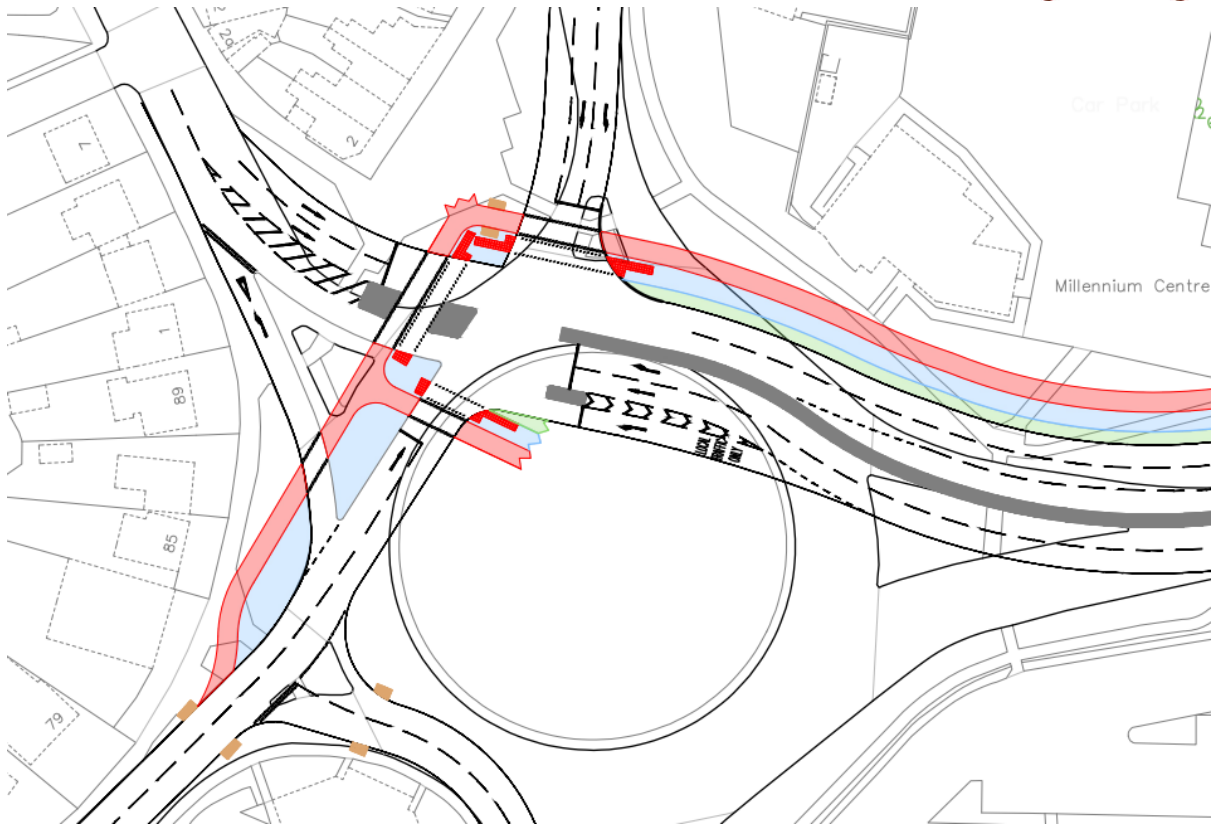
Concept Design of Eastfield Road - Crawthorne Road Junction
